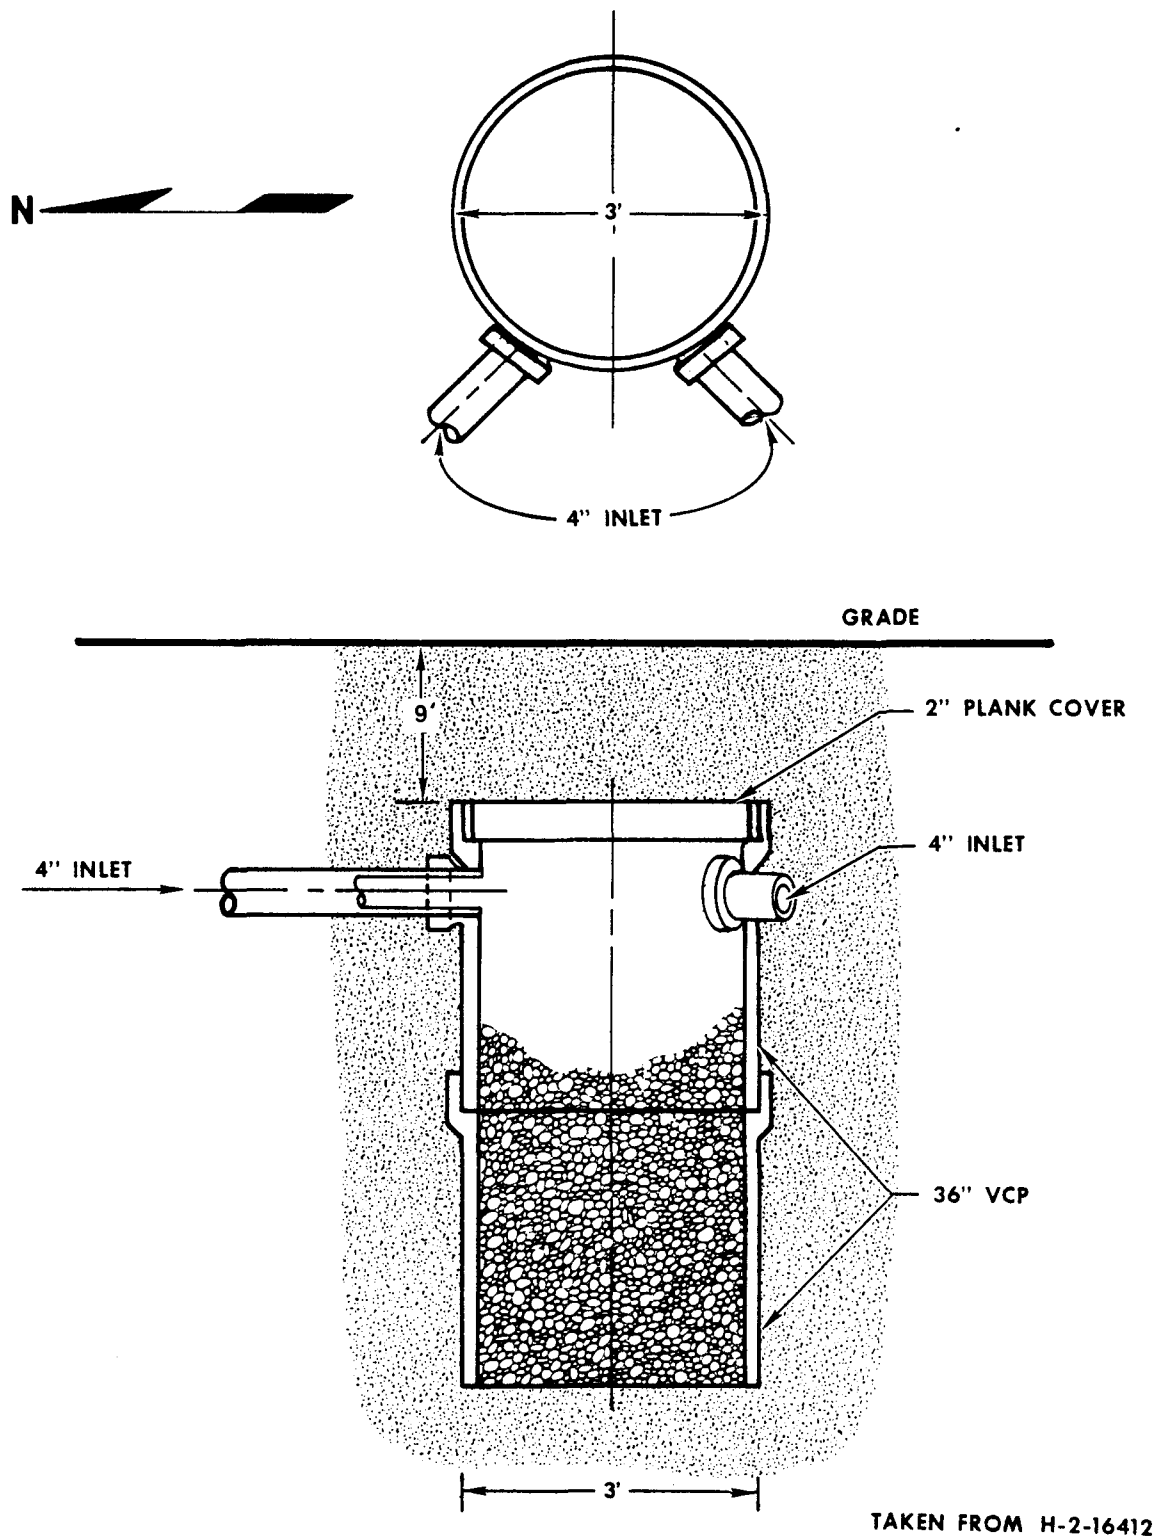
216-Z-13 French Drain Plan and Section. (D)
